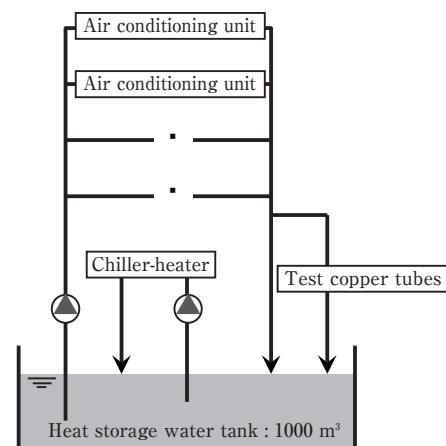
Heat storage water tank and installing position of the test copper tubes.
